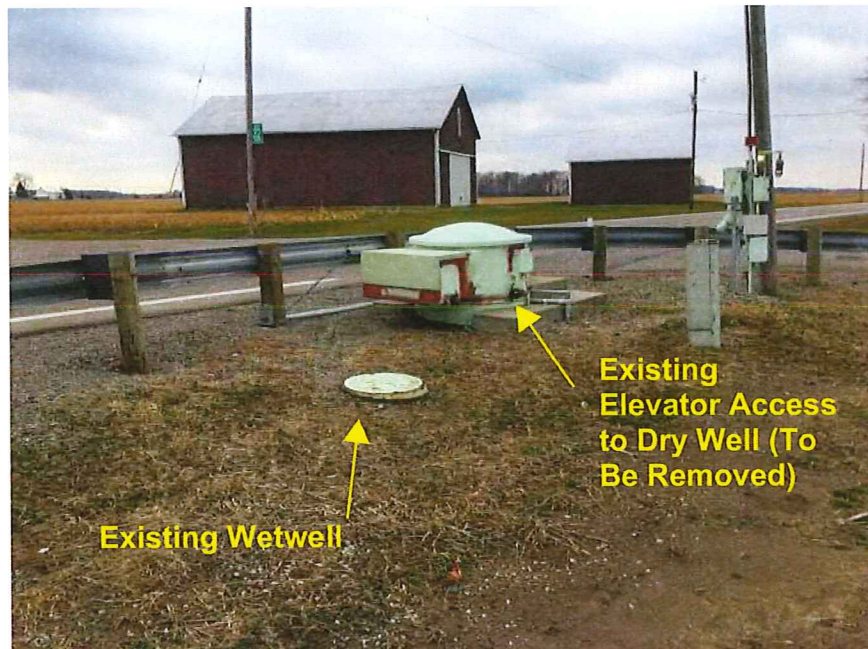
Existing Pump Station #2 Site at SR 34 and CR 22
